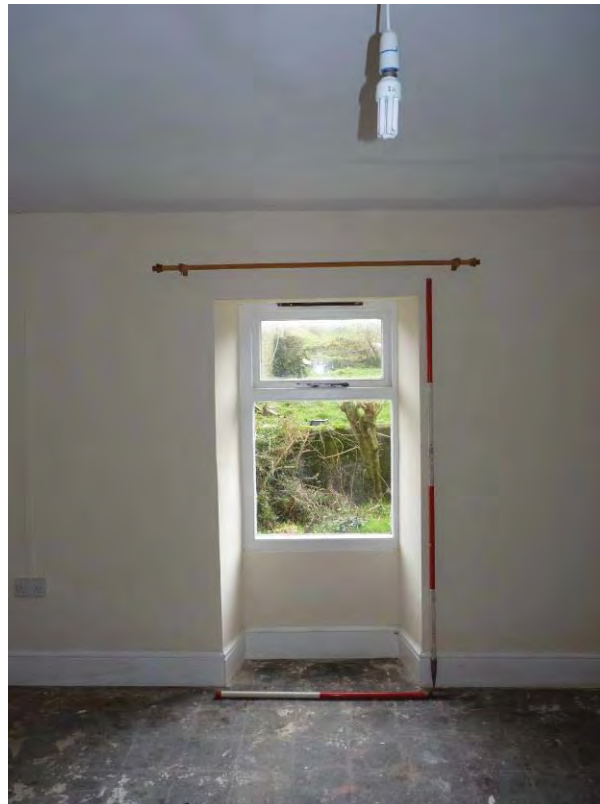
The Farmhouse interior, Room 1. Looking South. 1m & 2m scales.
